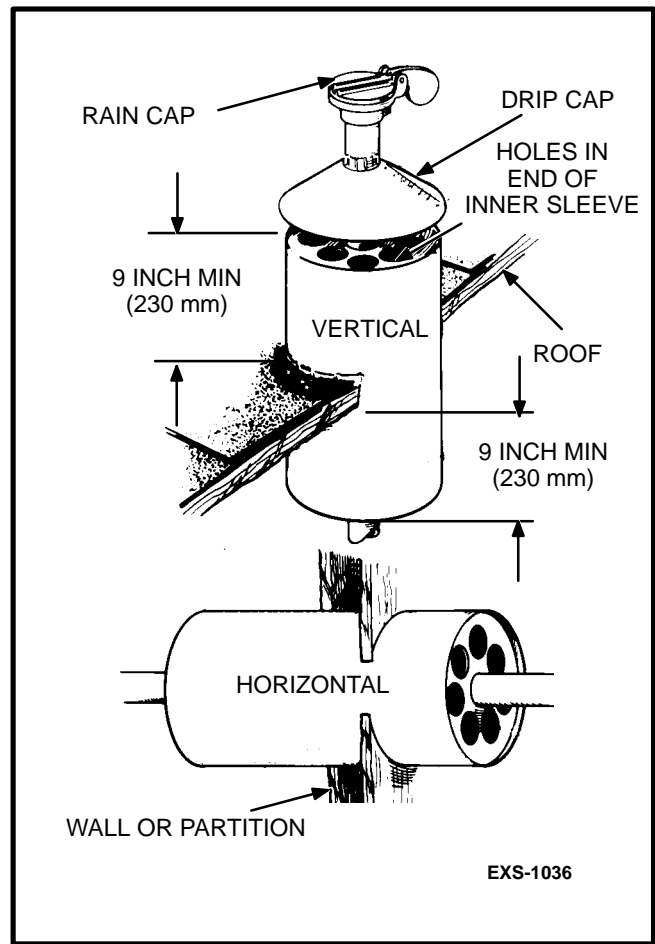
MOUNTING EXHAUST THIMBLE
